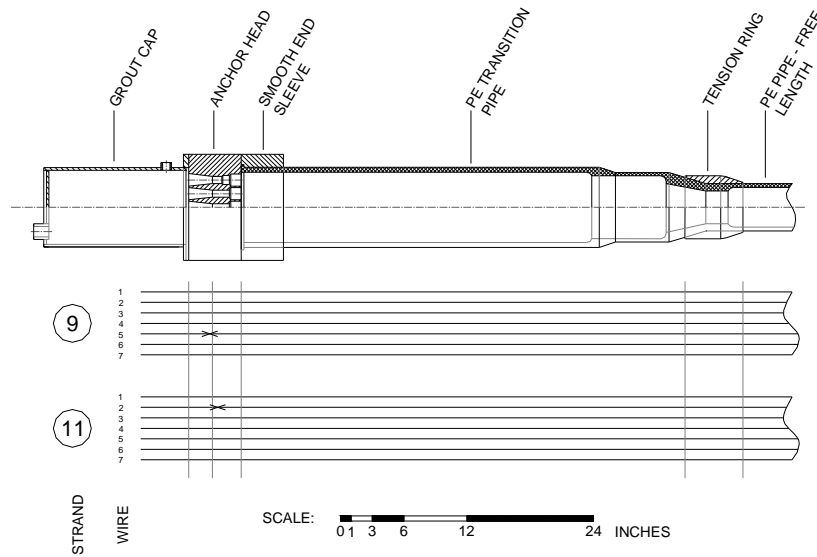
Scraping of Strand Due to Stressing at Tower End – Specimen 8
